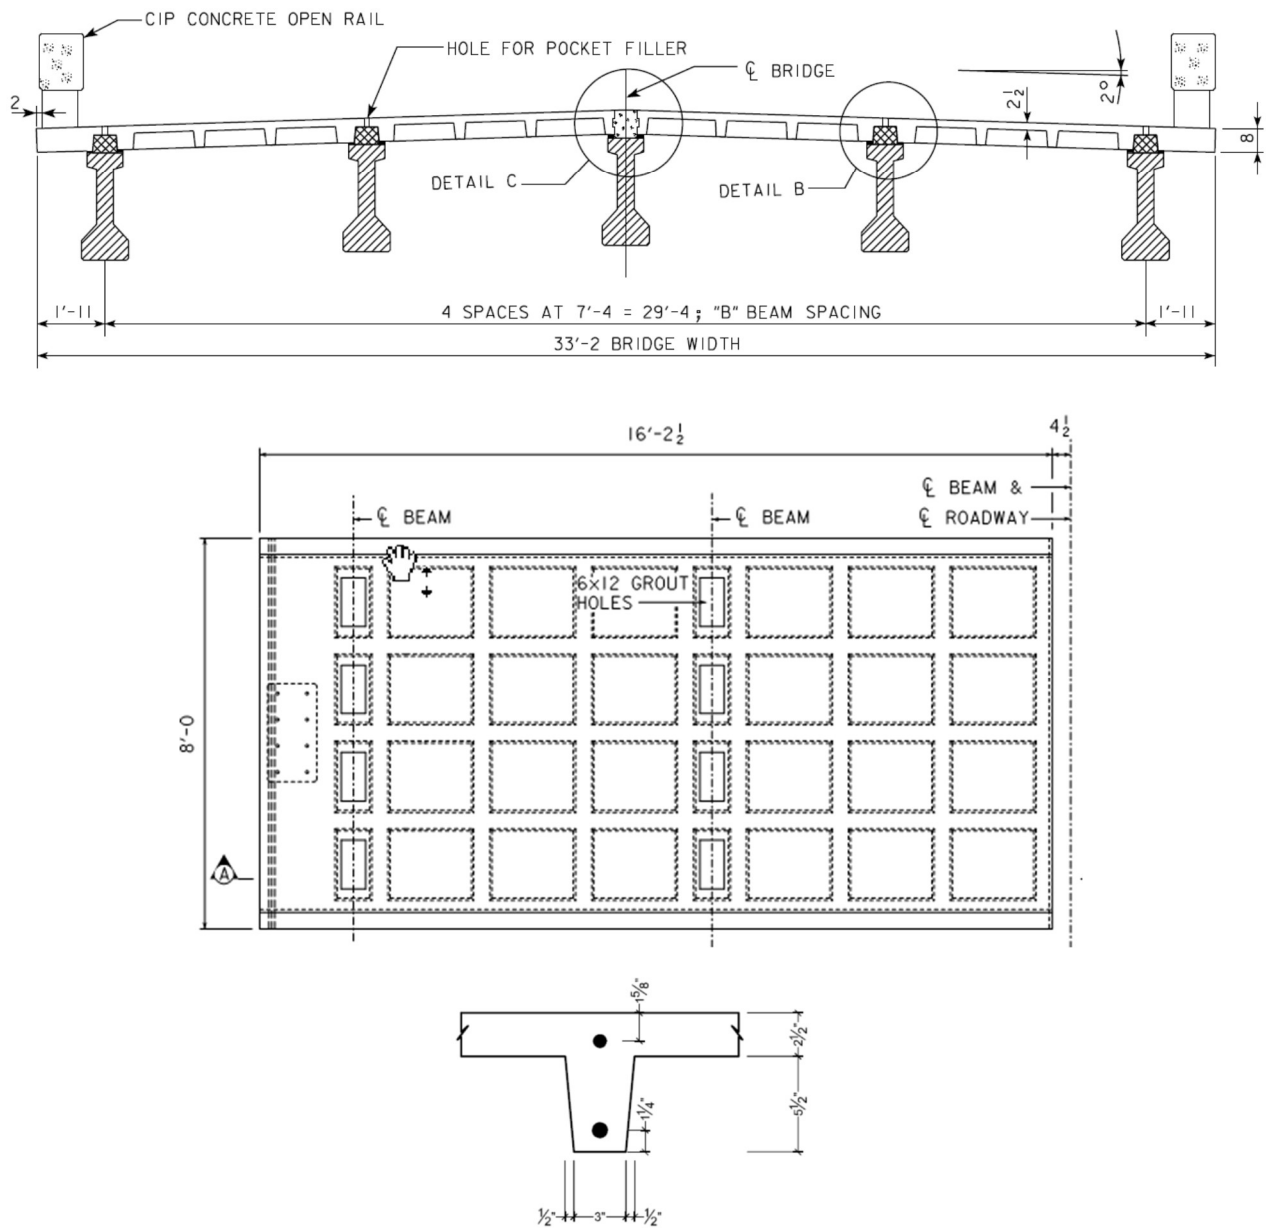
Views of UHPC waffle slab of Little Cedar Creek Bridge (Bierwagen, et al., 2010)
